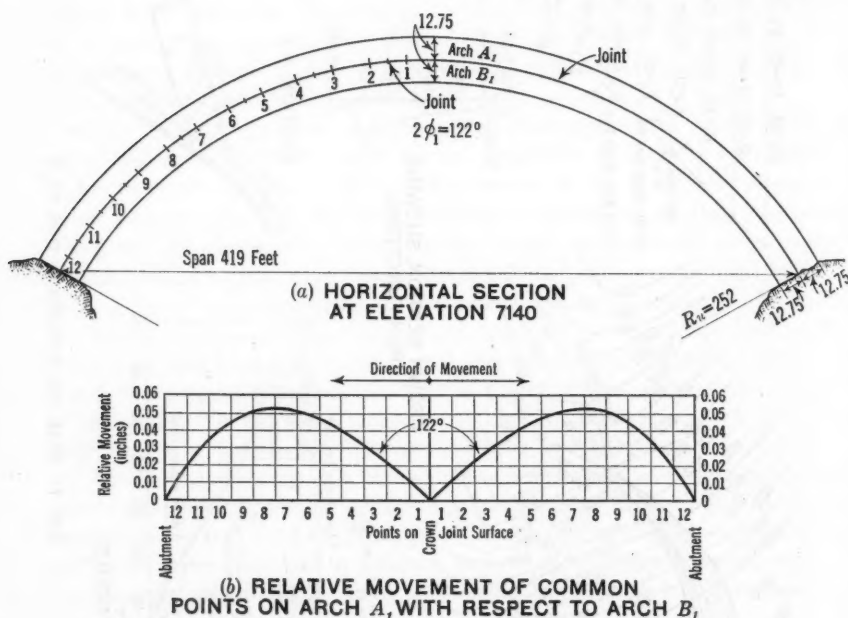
TYPICAL ARCH OF DAM NO. 1.
